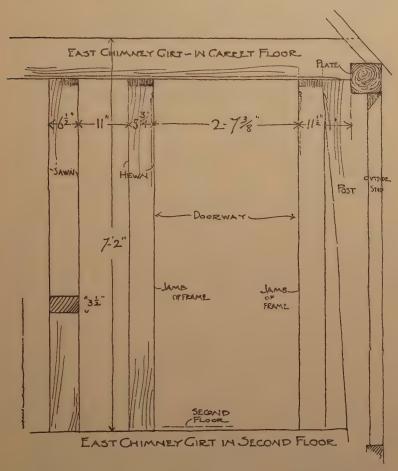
Doors. Frame of Door from Chamber, Fairbanks House, Dedham, Mass.
